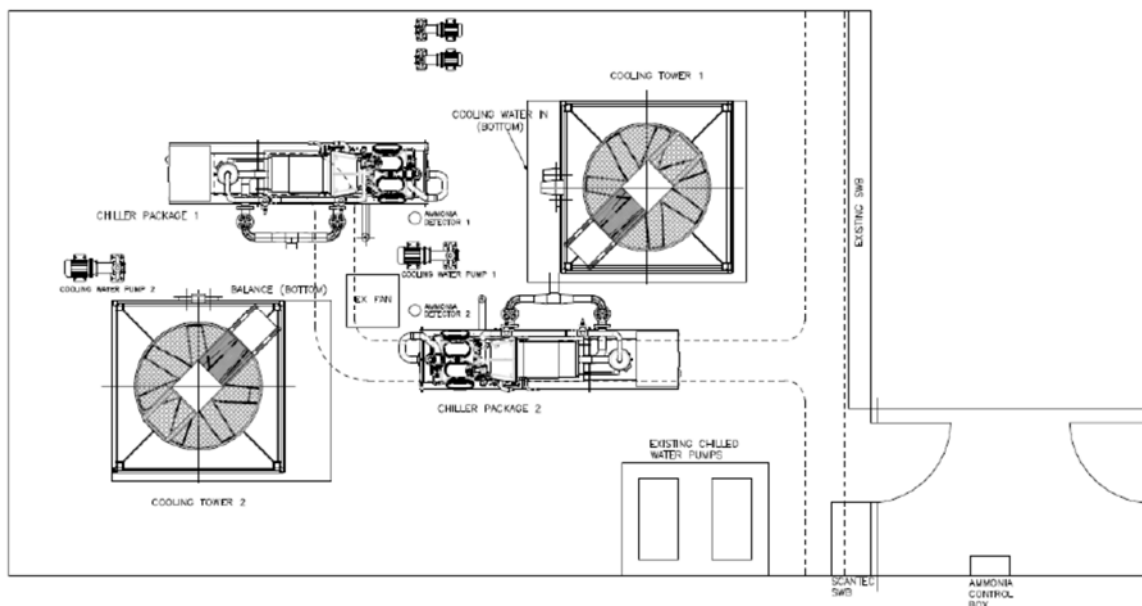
Plant Room Layout Showing NH₃ Chillers and Cooling Towers
